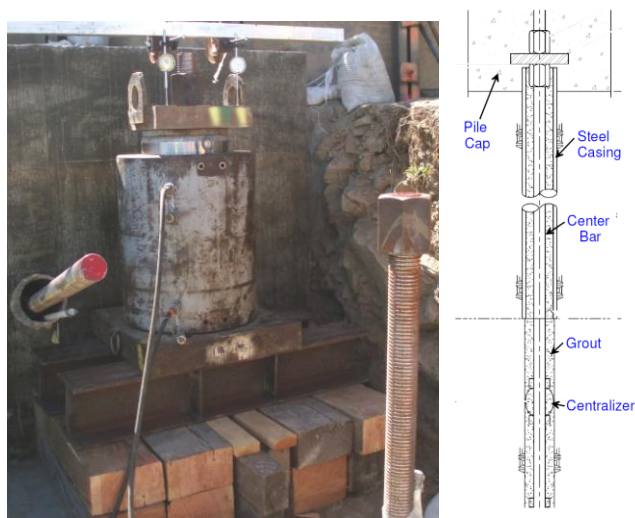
Tension proof test of a vertical pile at B2 and detail of a typical micropile
